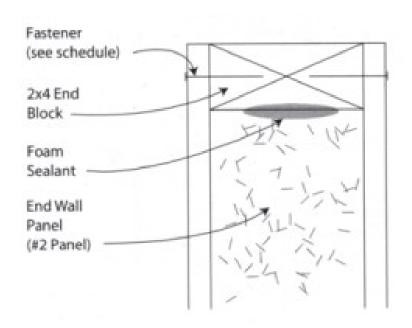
Foaming In-line Panel Joints. The drilled holes are for foaming of the panel joint, making the air barrier continuous at in-line panel joints.
